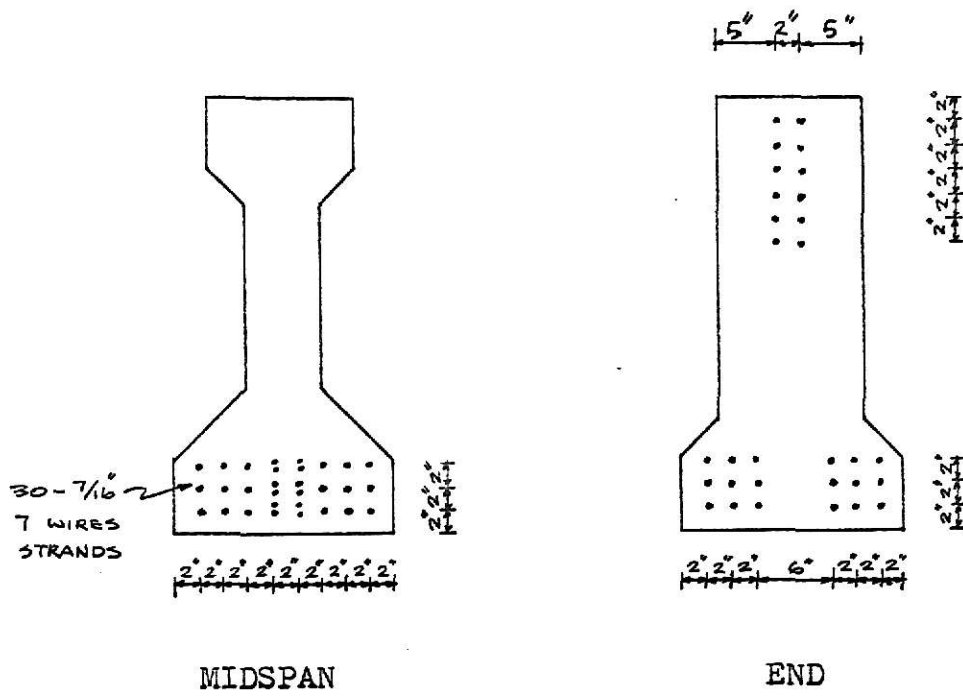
ARRANGEMENT OF PRESTRESSING STEEL OF SPAN BC
